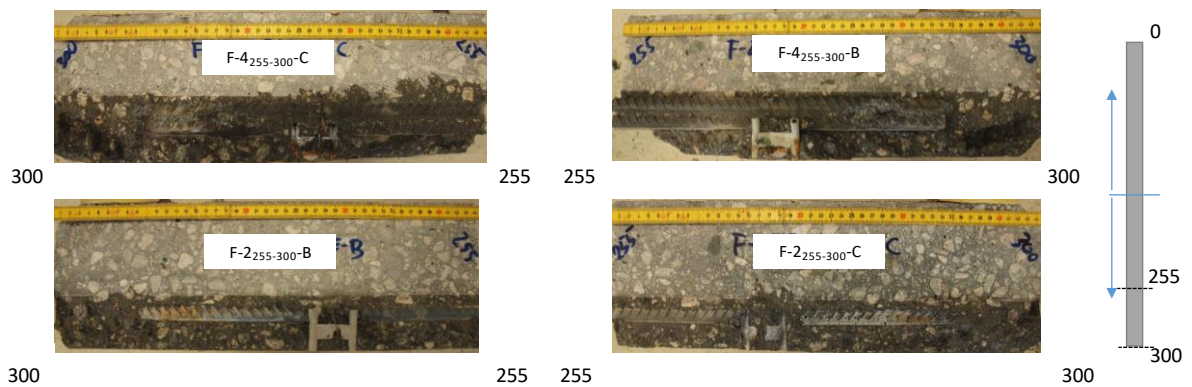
Steel-concrete interface of beam B section 245 to 300 cm. White precipitate at the cracks and spread over the steel-concrete interface. Superficial rust
